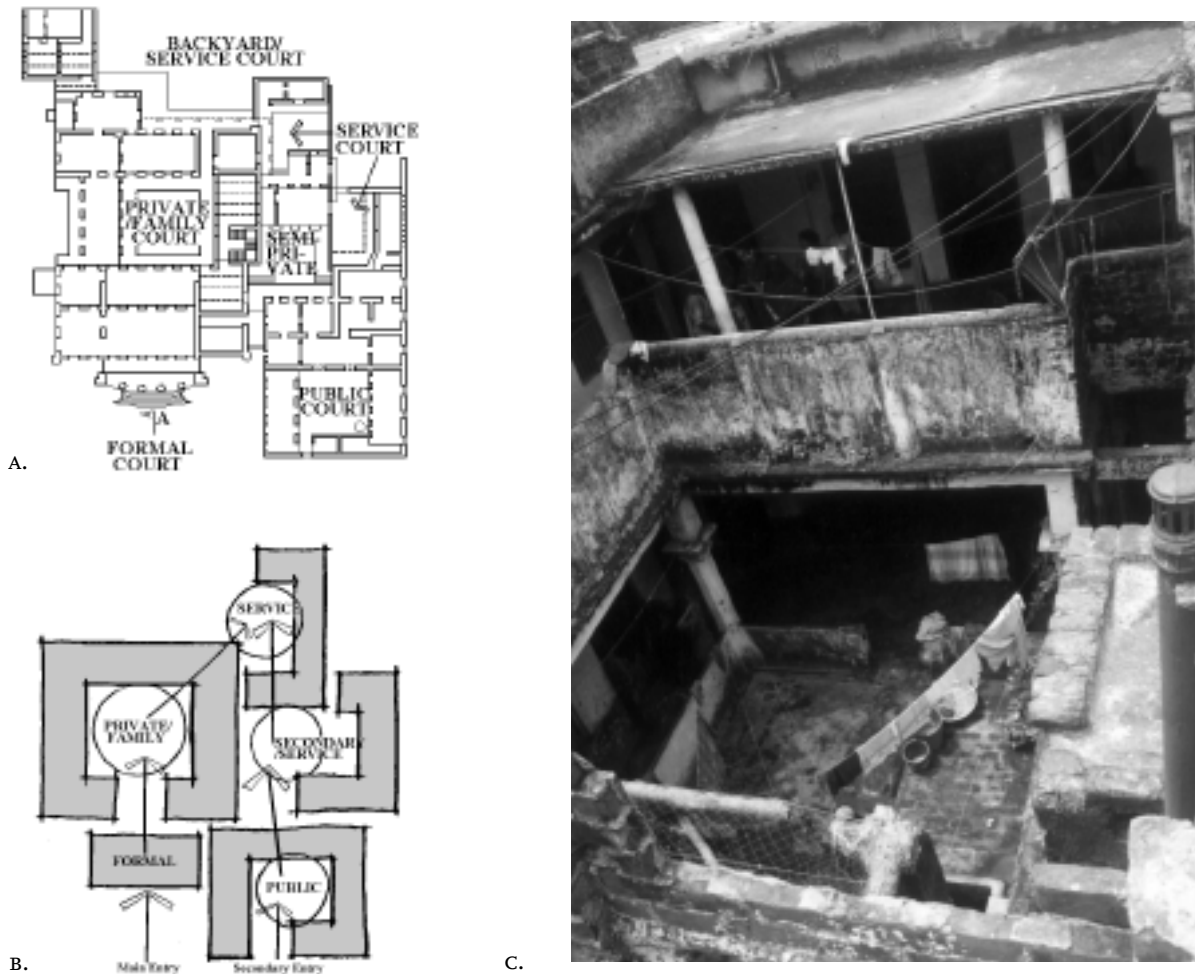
A) ground floor plan. B) Articulation of Zones. C) View of service court.
